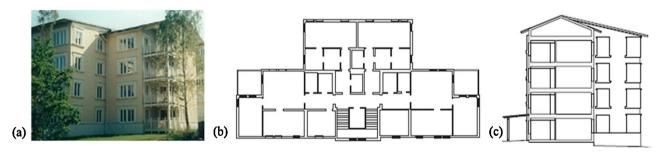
Photograph (a) and sketch of ground floor plan (b) and vertical section (c) of the reference building.
